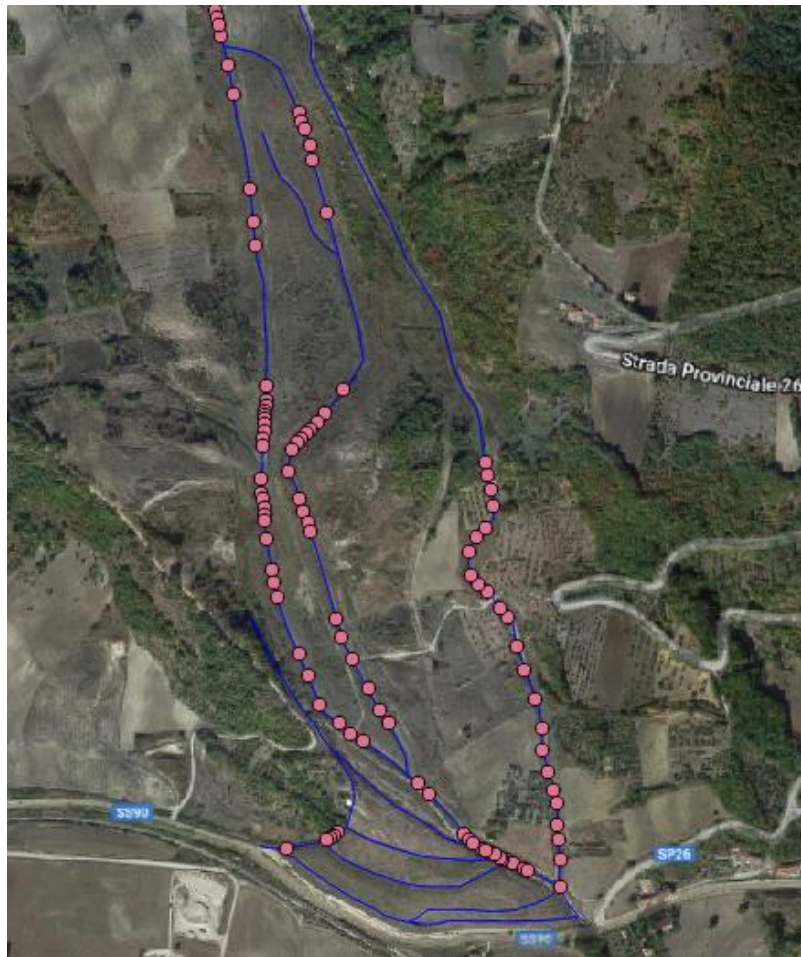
Longitudinal profile of the landslide area with stabilization works: draining trenches (pink points) and drainage channels (blue lines)
